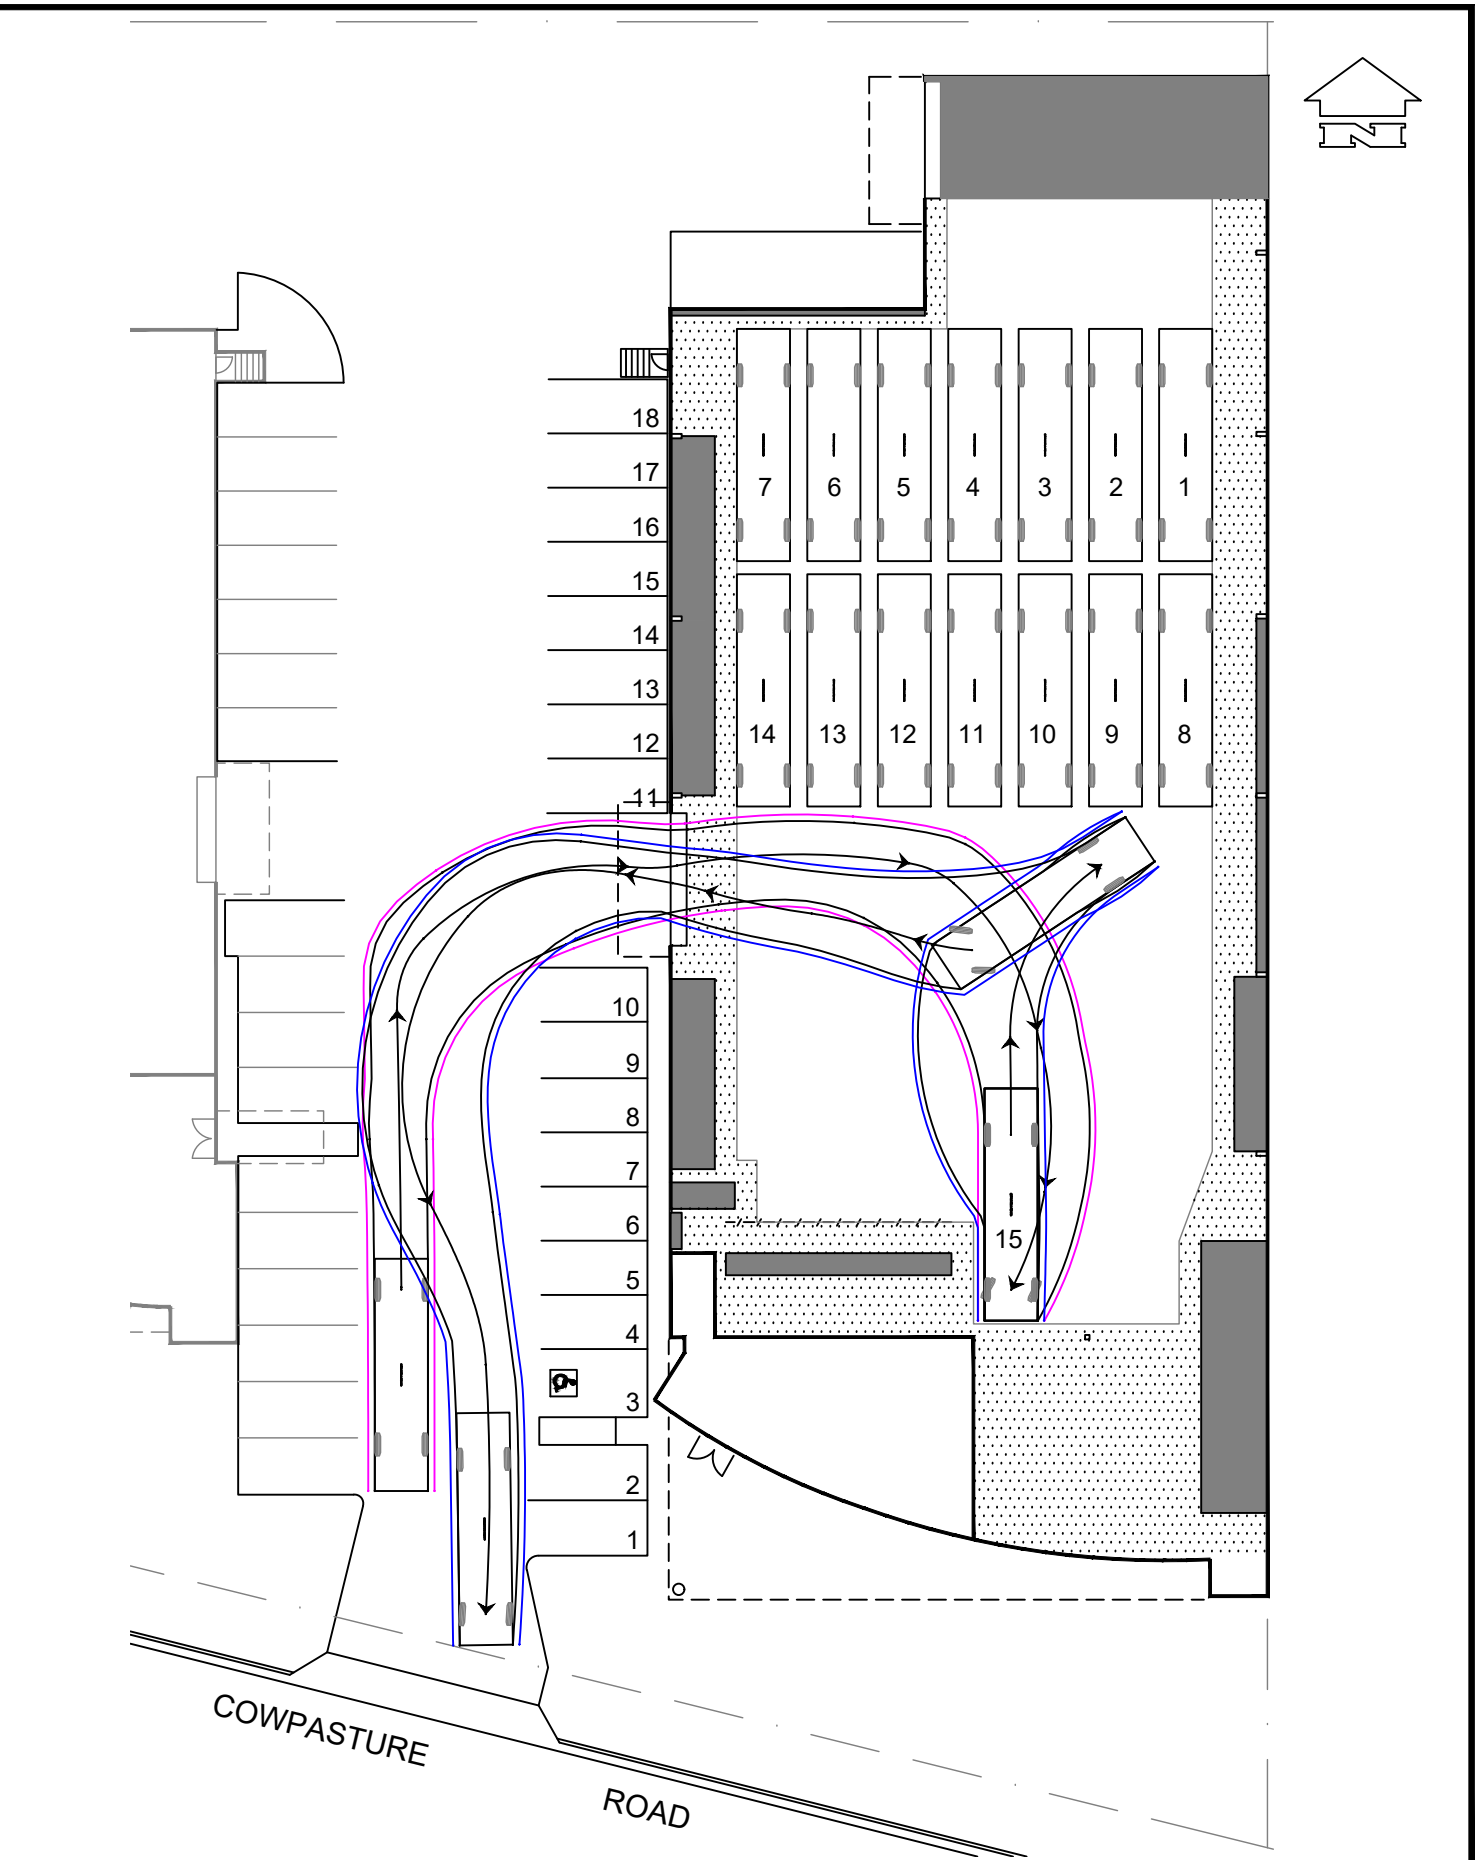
A and 12B show the site layout for Unit 2, 103 Cowpasture Road.
